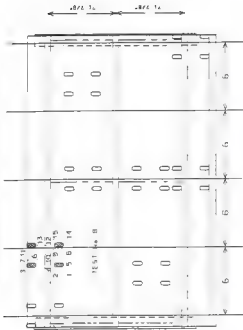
LVDT Locations (Third Bridge - Test No 83)
